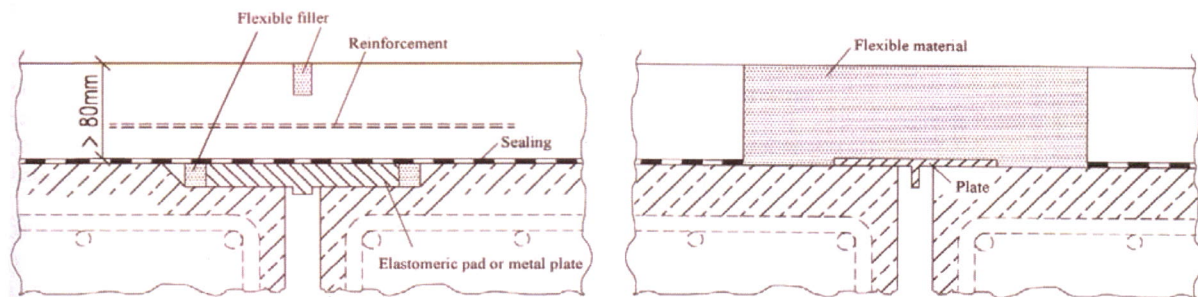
Left: Buried expansion joint; Right: Asphalt plug joint.
